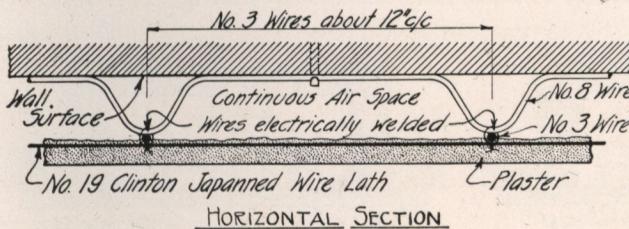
Clinton Welded Wire Wall Furring
